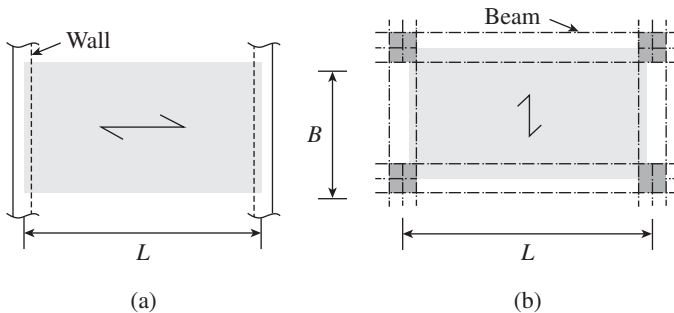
Plan view of one-way slab (a) Supported on two opposite edges (b) Supported on all edges ($L/B > 2$)
